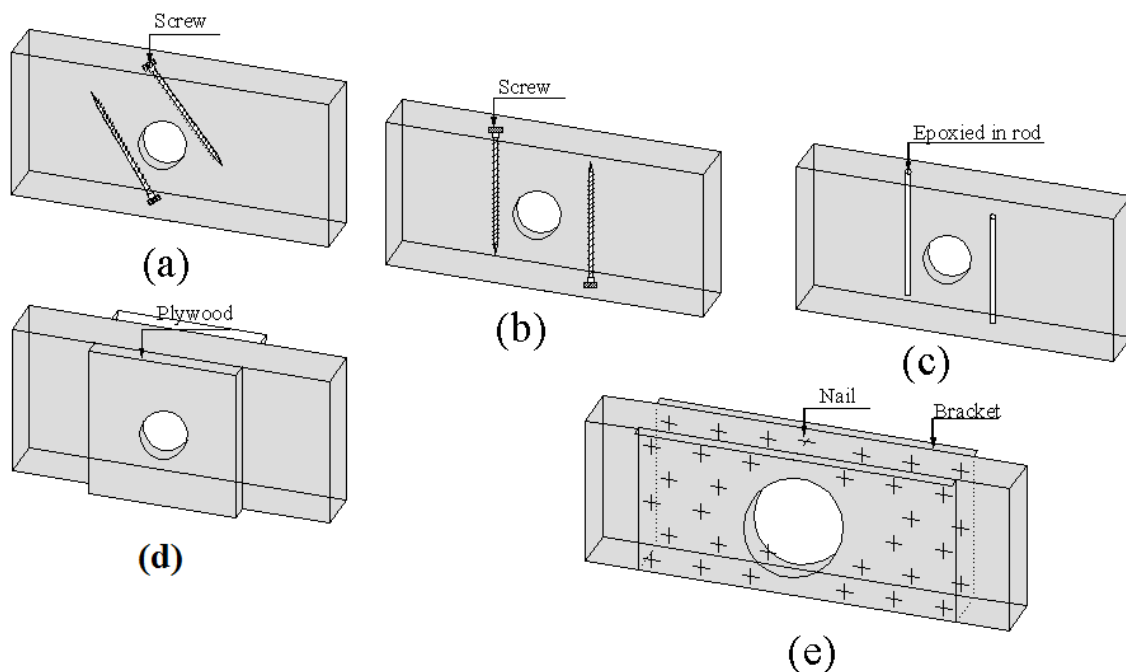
Sketch of different types of reinforcing around holes in LVL beams: (a) inclined screws, (b) vertical screw, (c) epoxy grouted rod, (d) plywood, (e) steel bracket
